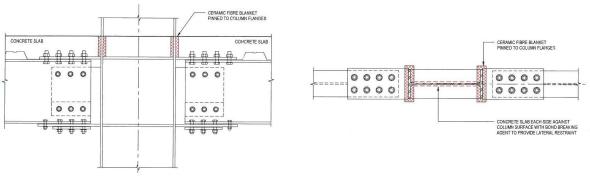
Sliding Hinge - Top Flange/Slab Isolation Details
